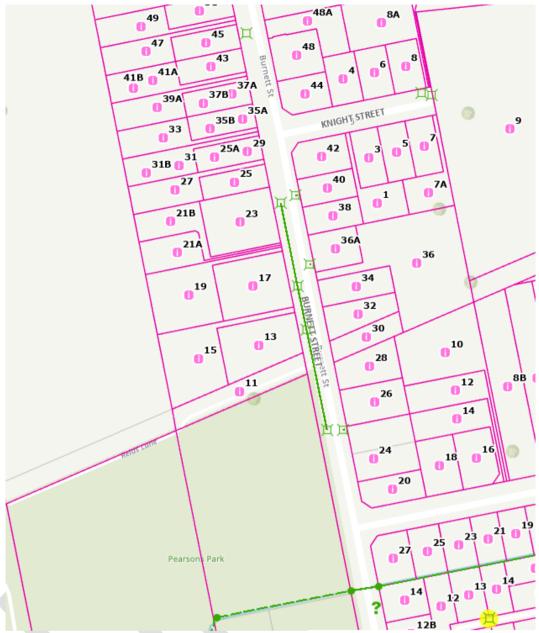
Existing Stormwater Layout: 14 – 48A Burnett Street
